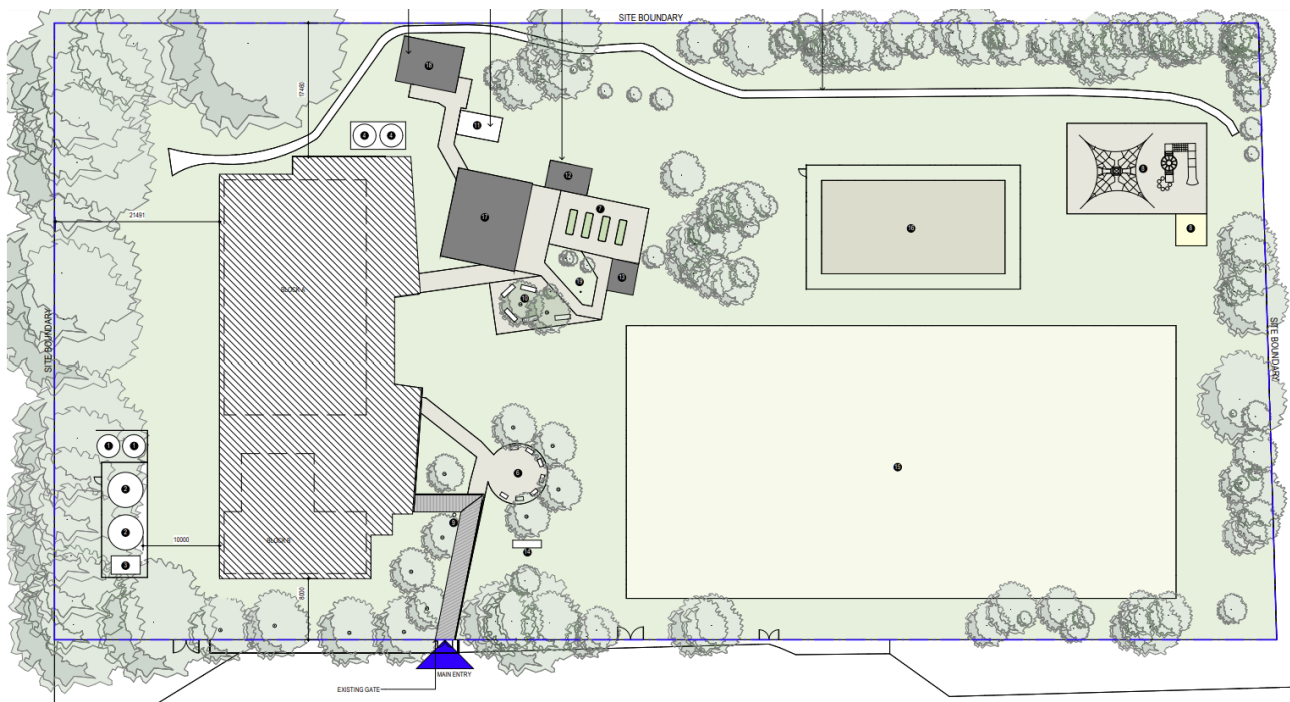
Proposed Site Plan (Source: Pedavoli Architects)
